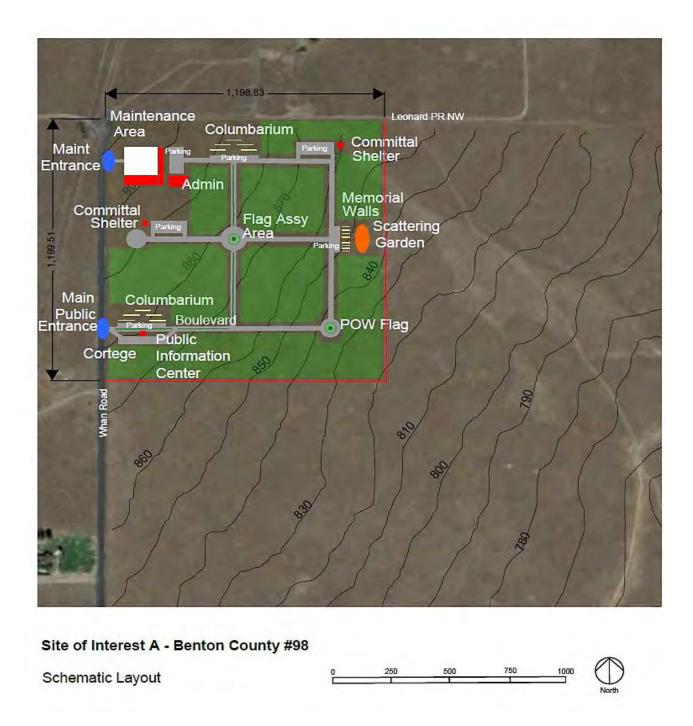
Schematic Layout of Site of Interest A, Benton County #98
